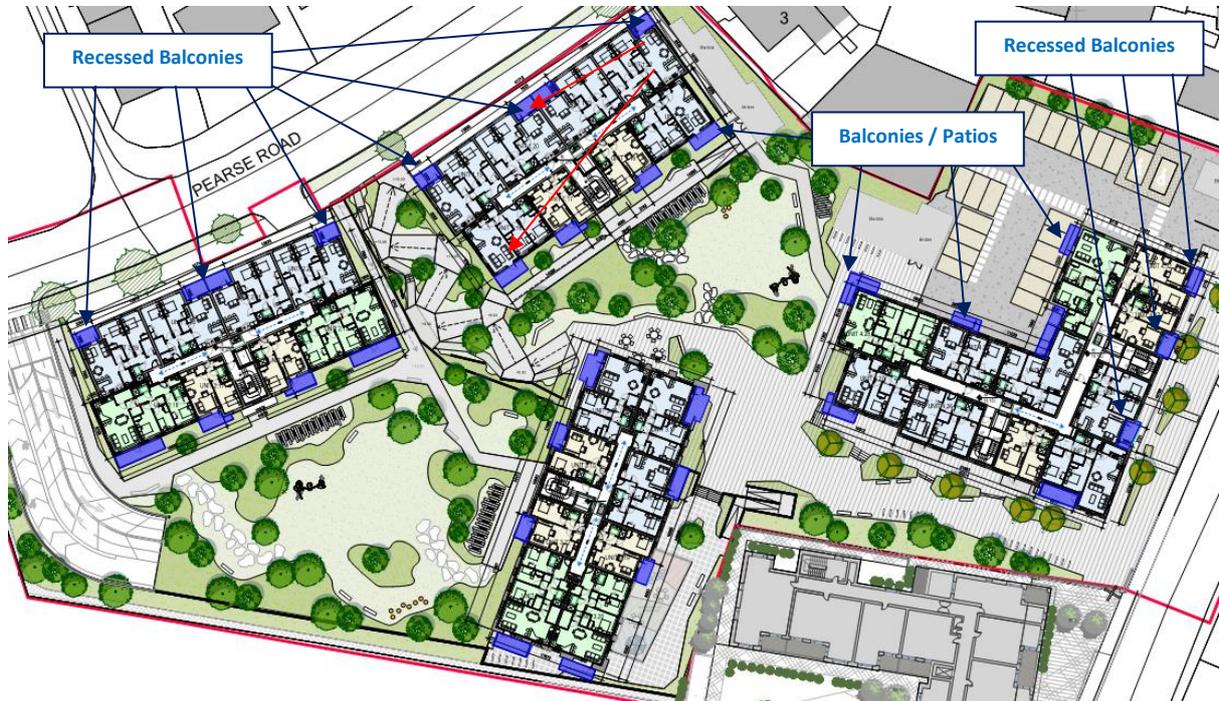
Proposed Development Balcony / Patios Locations (Typical Floor)
